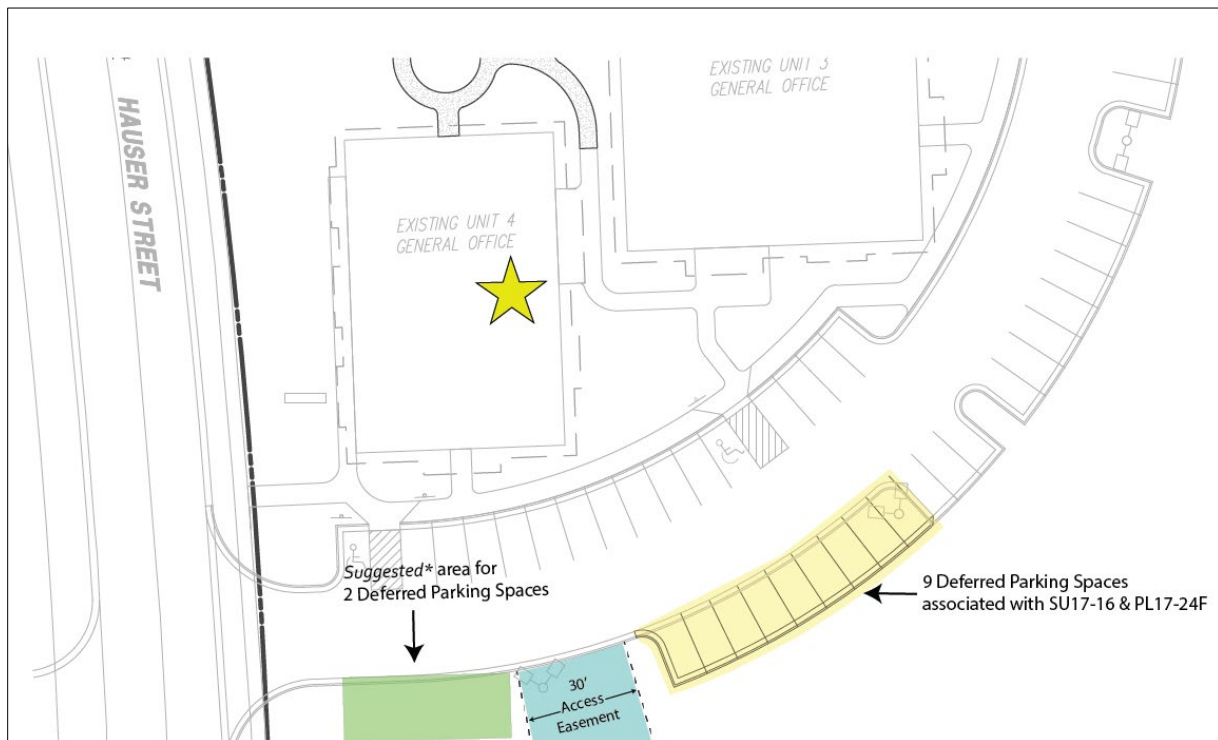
Snippet of approved deferred parking plans from 2017 showing the 9 deferred parking spaces in yellow and the suggested area to place two deferred parking spaces for Optimum Eye Care is in green. A 30' access easement is highlighted in blue. The subject site is identified by the yellow star. The final location for deferred parking will be identified by applicant and Staff in a written statement and parking plan.
